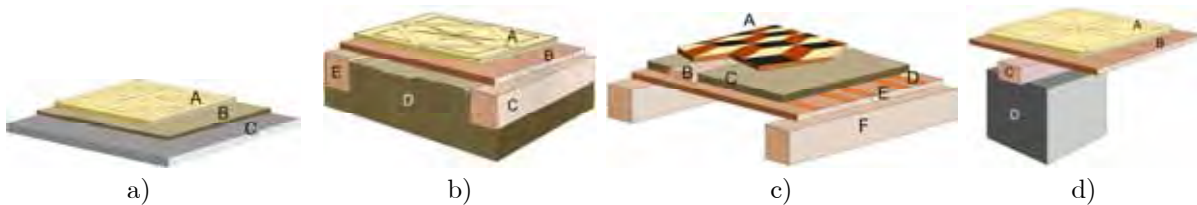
Diagram of floor structure in the Łańcut Castle:
